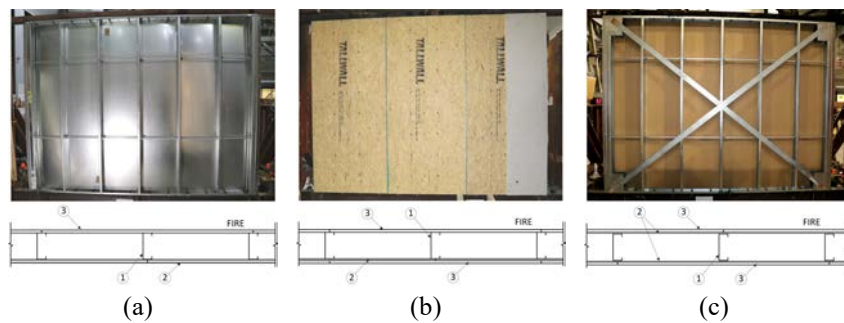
Wall cross sections: (a) gypsum-sheet steel composite panel sheathed walls; (b) Oriented Strand Board sheathed walls; (c) strap braced walls (1 – steel framing; 2 – sheathing or straps; 3 – gypsum board)
